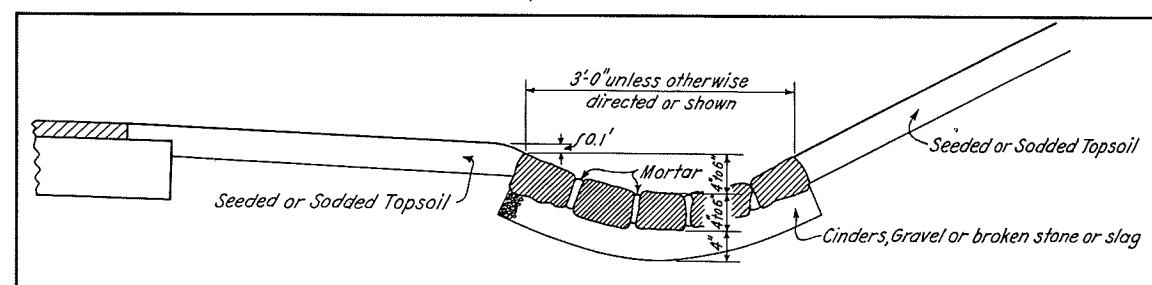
Historic detail, rubble masonry waterway, 1941. Drawing courtesy FHWA.
